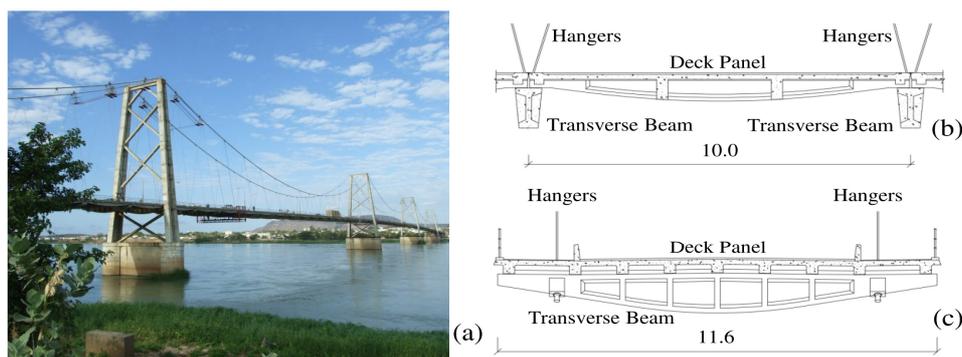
The Samora Machel Bridge: (a), perspective view (b) longitudinal section, (c) transverse section.
